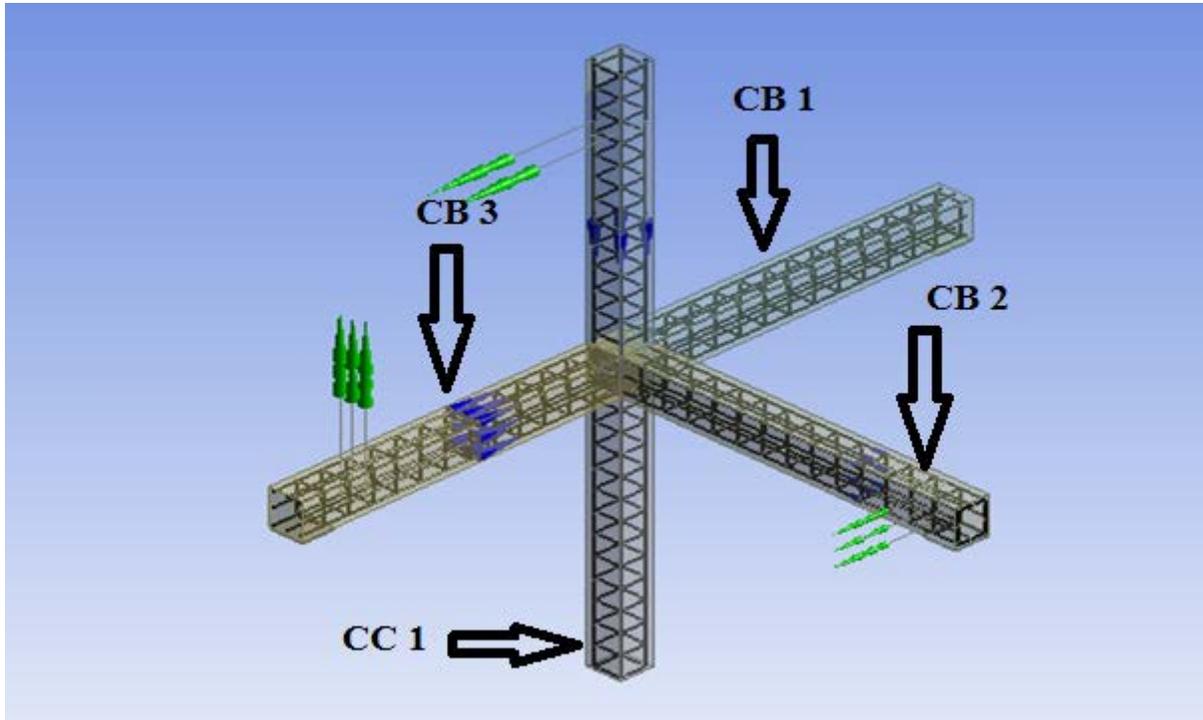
Geometric model and reinforcement detailing of joint with three beams (CS3)
